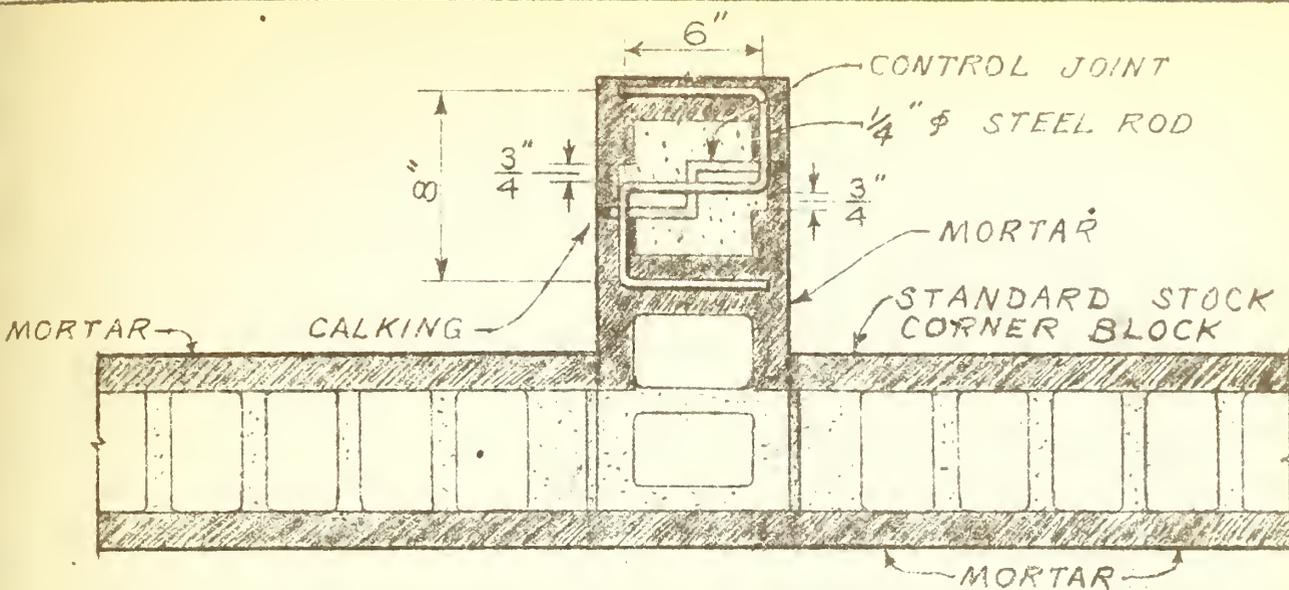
WALL INTERSECTION SHOWING WIRE WALL TIES
